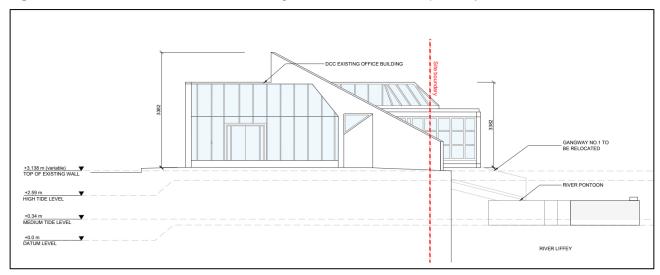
Existing elevations (Planning Report, Urban Agency)
